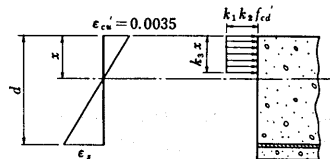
Concrete strain and rectangular compressive stress distribution (equivalent stress block)
